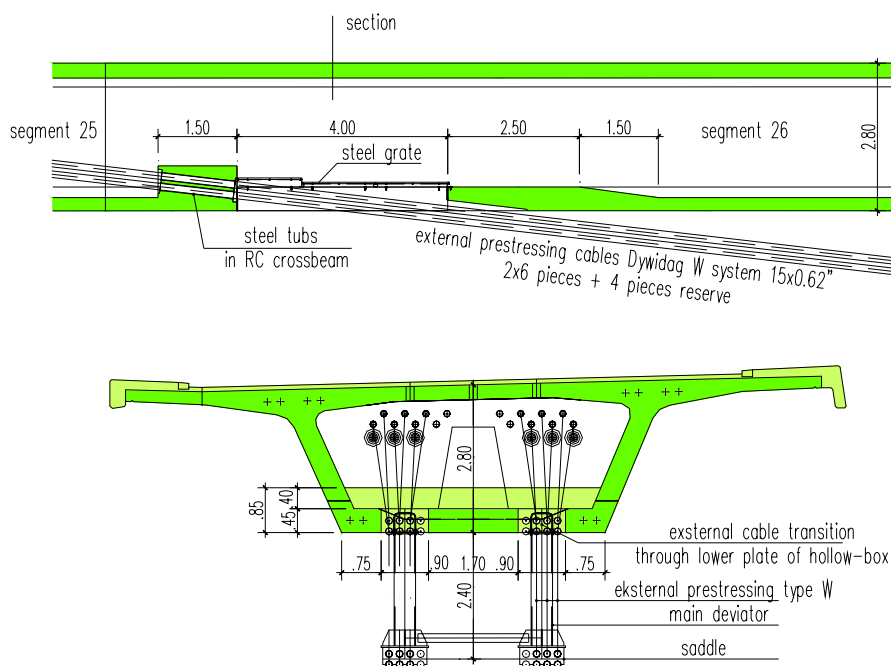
Section through the perforation in the bottom slab for the cable outlet
